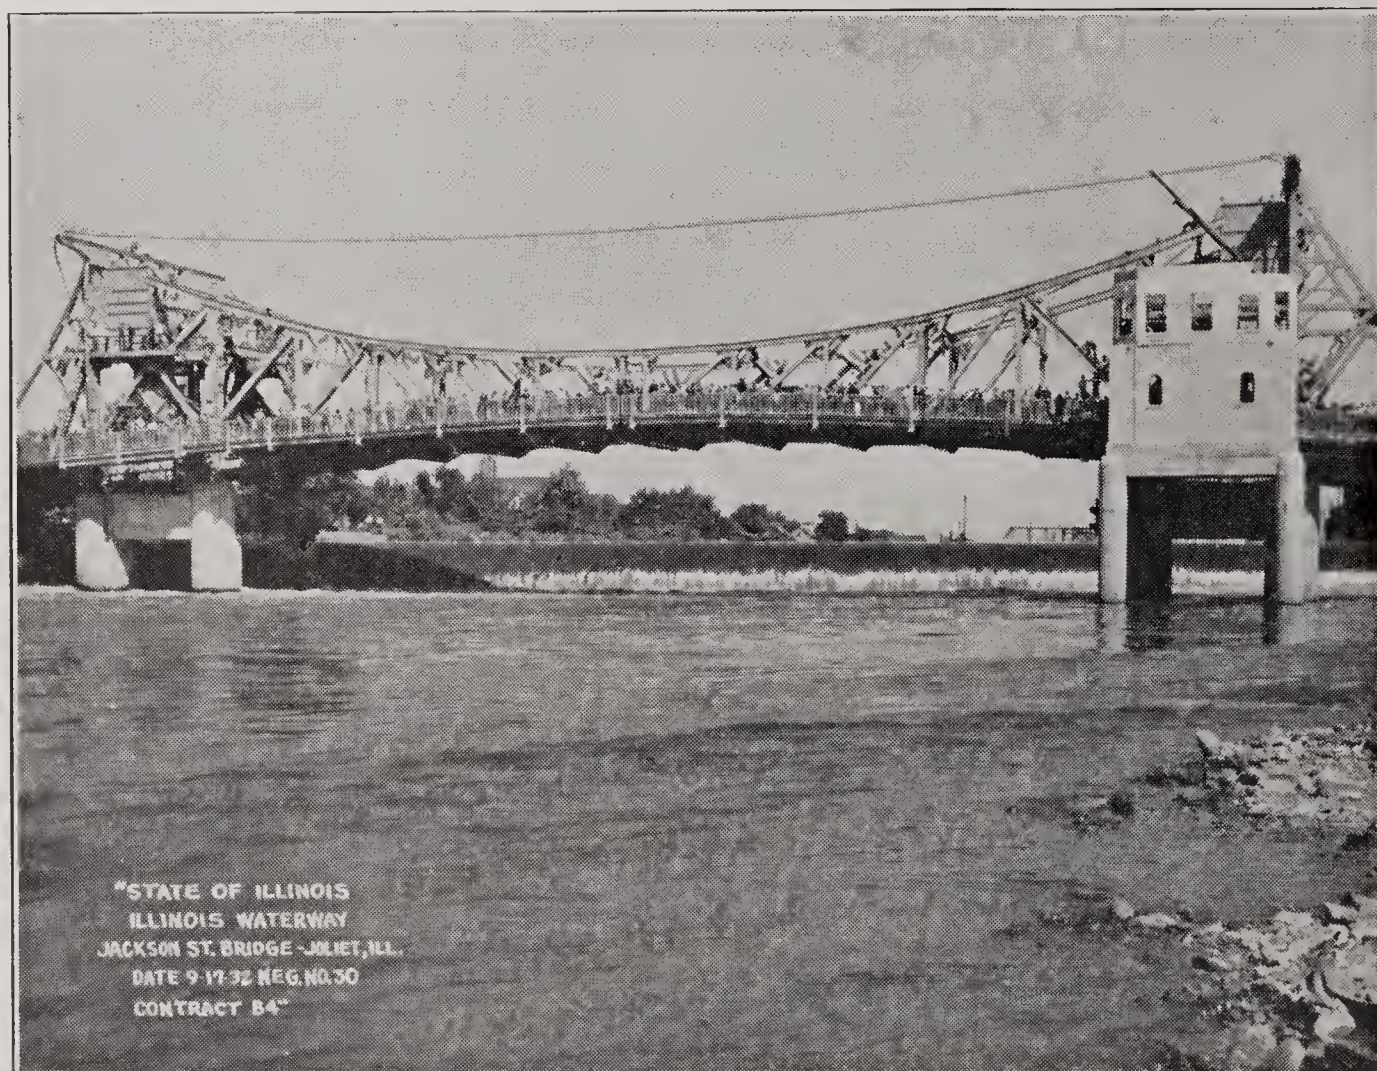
Jackson Street Bridge, Joliet, looking north.
